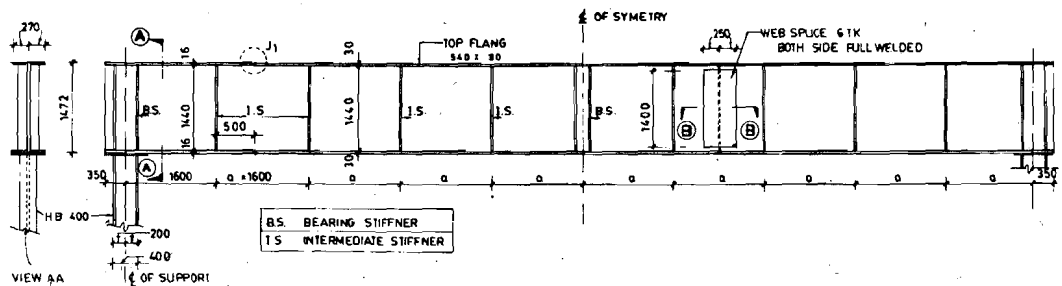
(b) : Elevation of Solid Web Plate Girder
